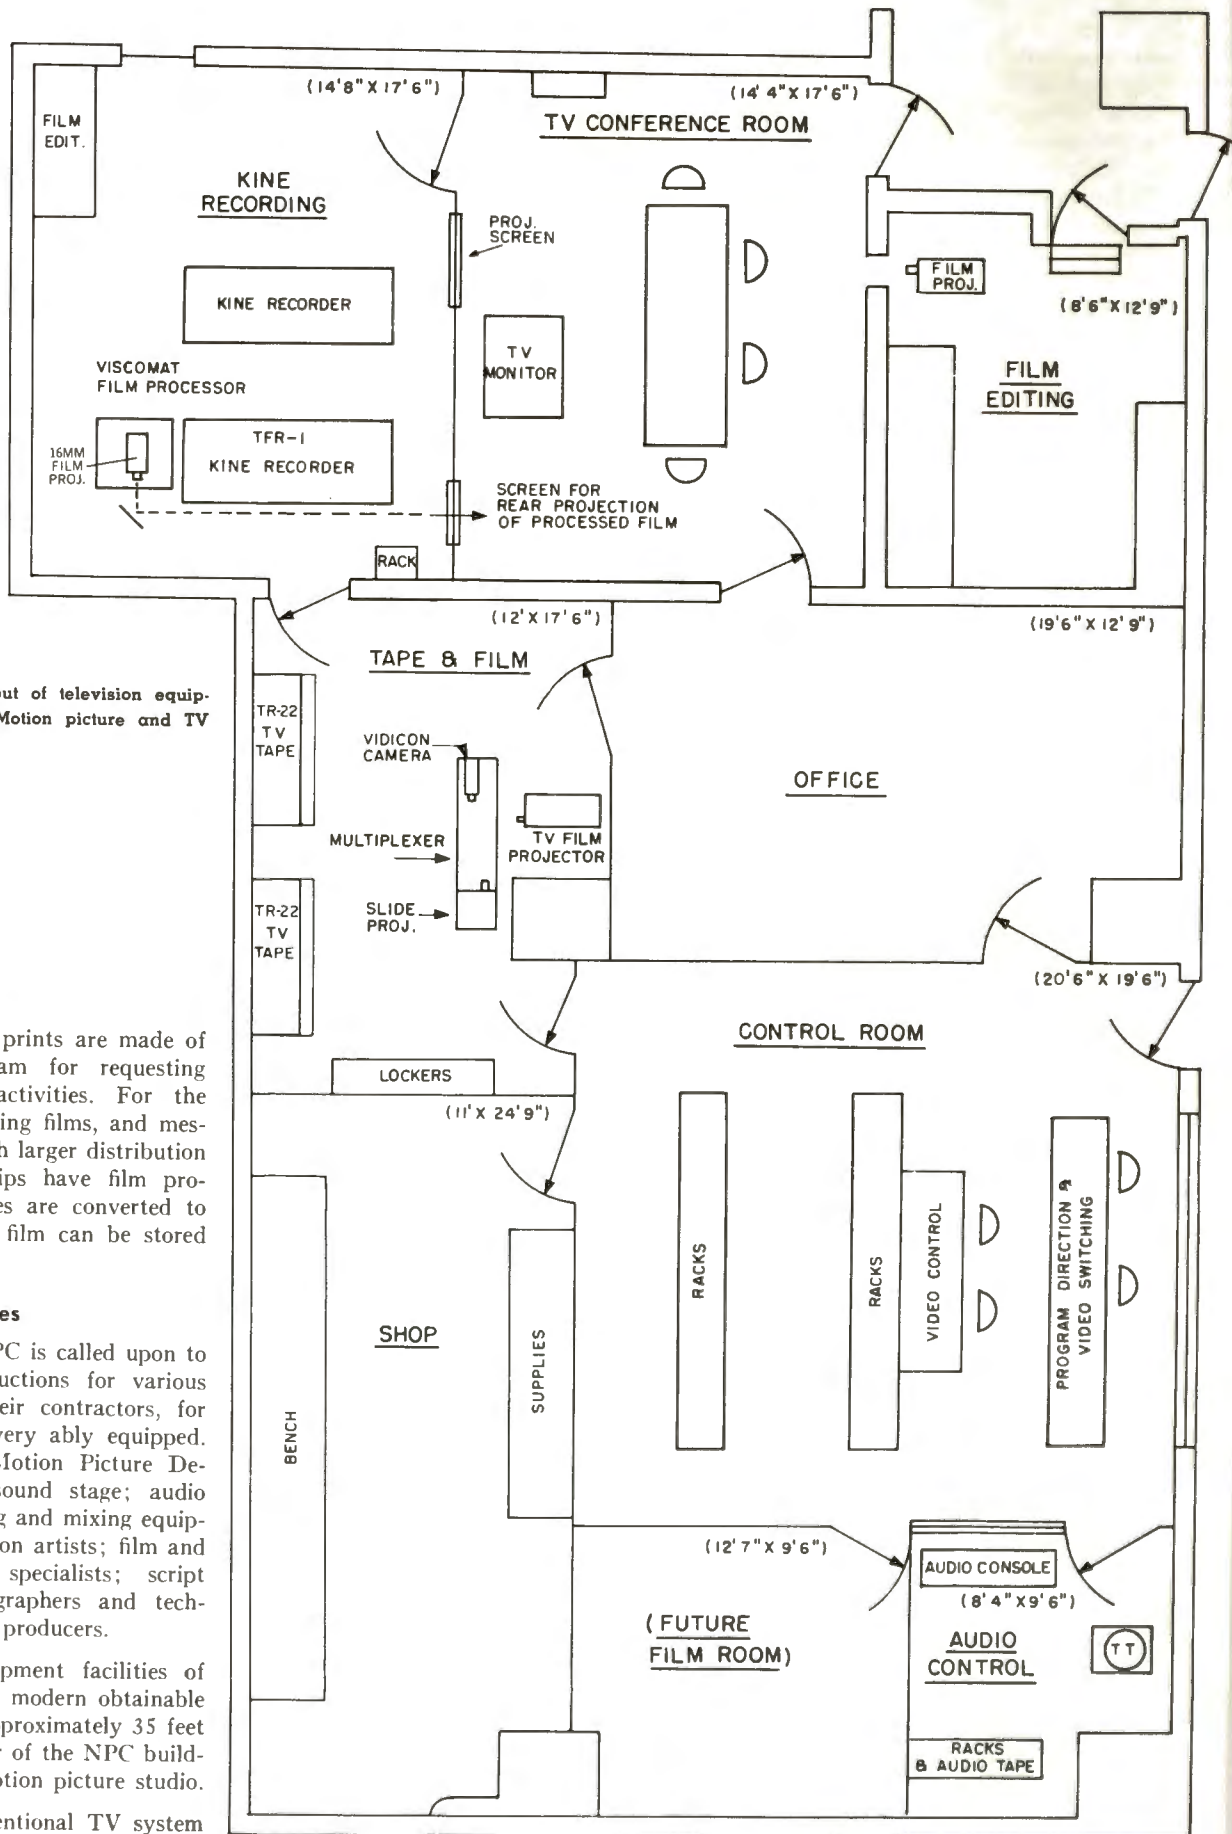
Floor plan layout of television equipment facilities at NPC. (Motion picture and TV studios are not shown.)
